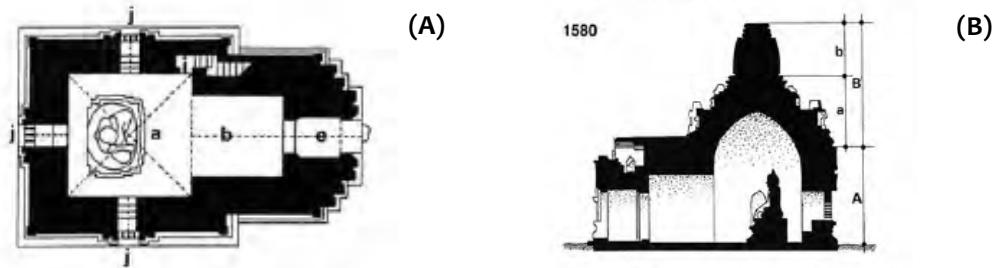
Plan and Sectional Elevation of a Temple with a Central Shrine (Pichard, 1992)
